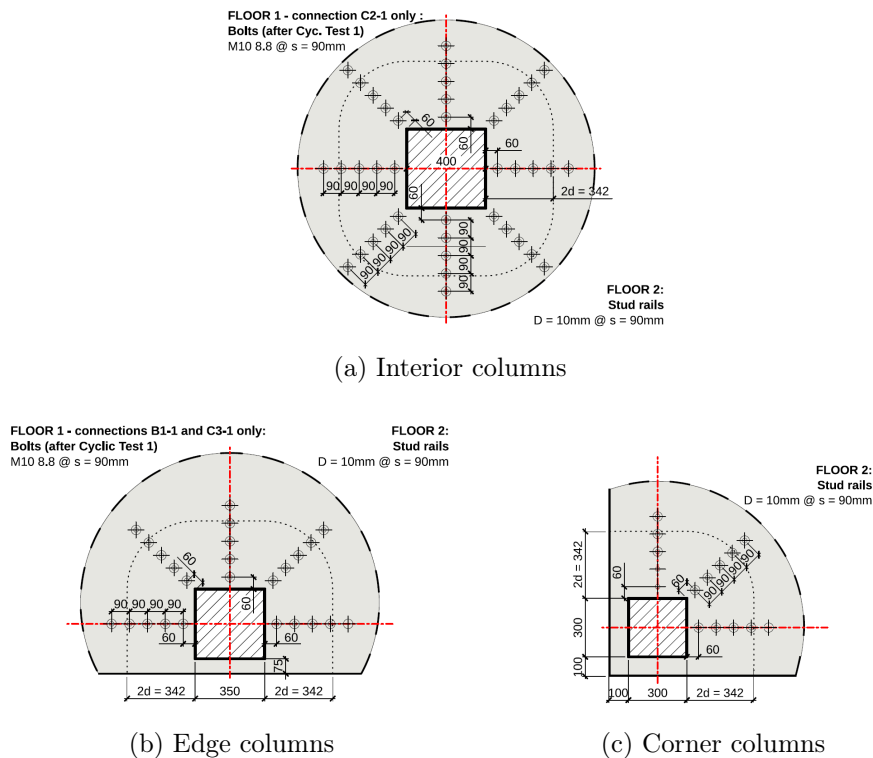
Punching shear reinforcement layout of slab-column connections at second floor and at first floor after damage of connections [1].
